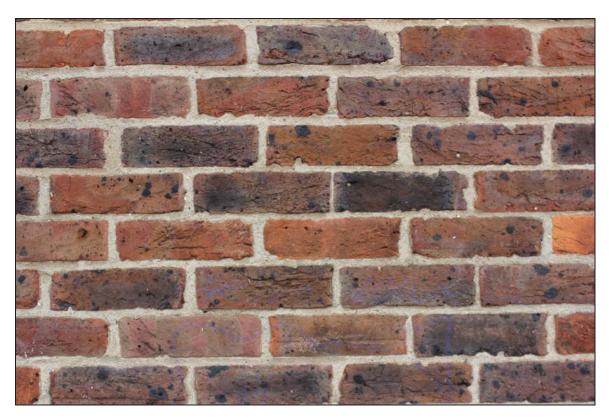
Brickwork on the west elevation, taken from the west (DP 11)
